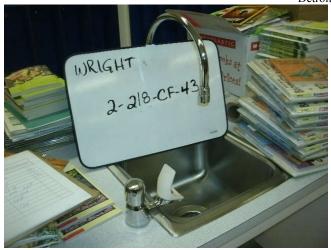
Classroom faucet w/bubbler, located on the 2nd floor, in room 218.
